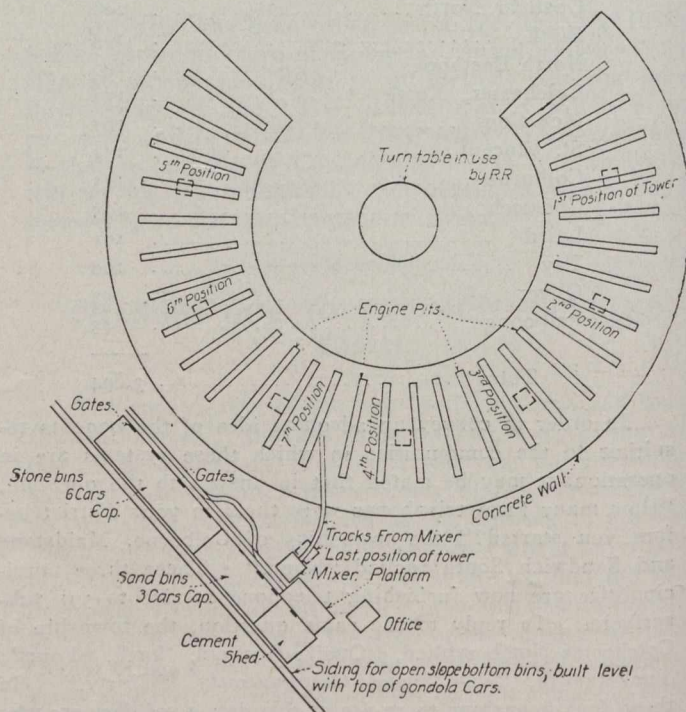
Plan of Concrete Roundhouse and Construction Plant.
